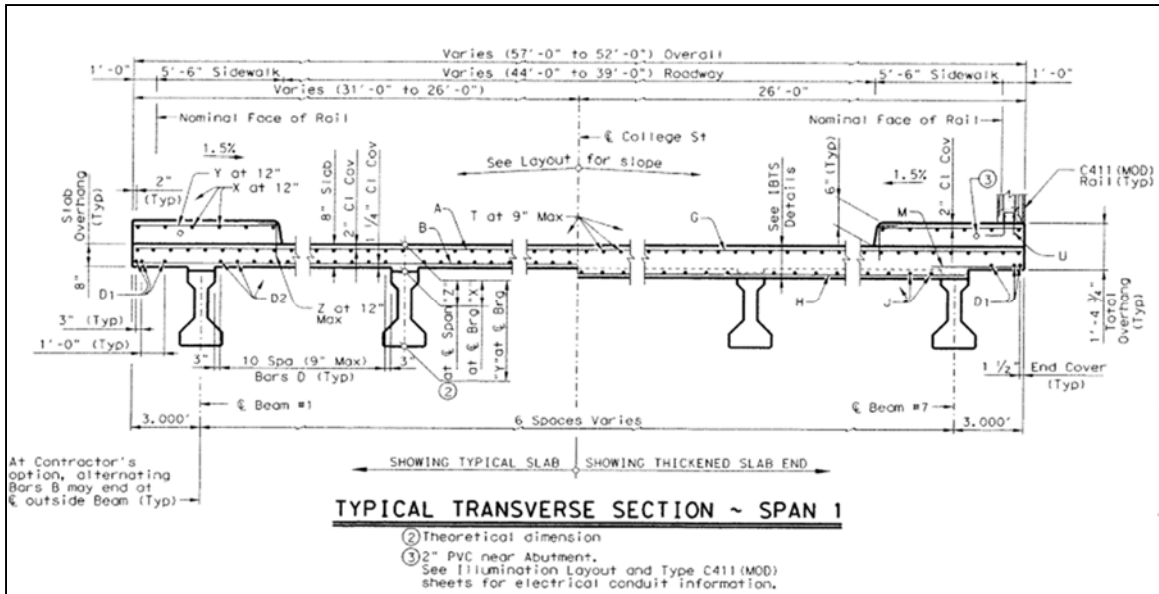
Cross section of Georgetown bridge deck: summer pour.
